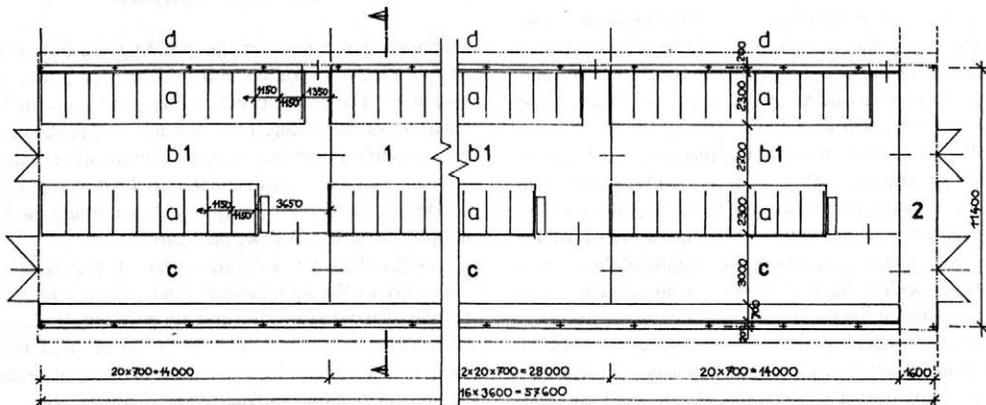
Dairy cow facility (80 heads) – groundplan; cross section
